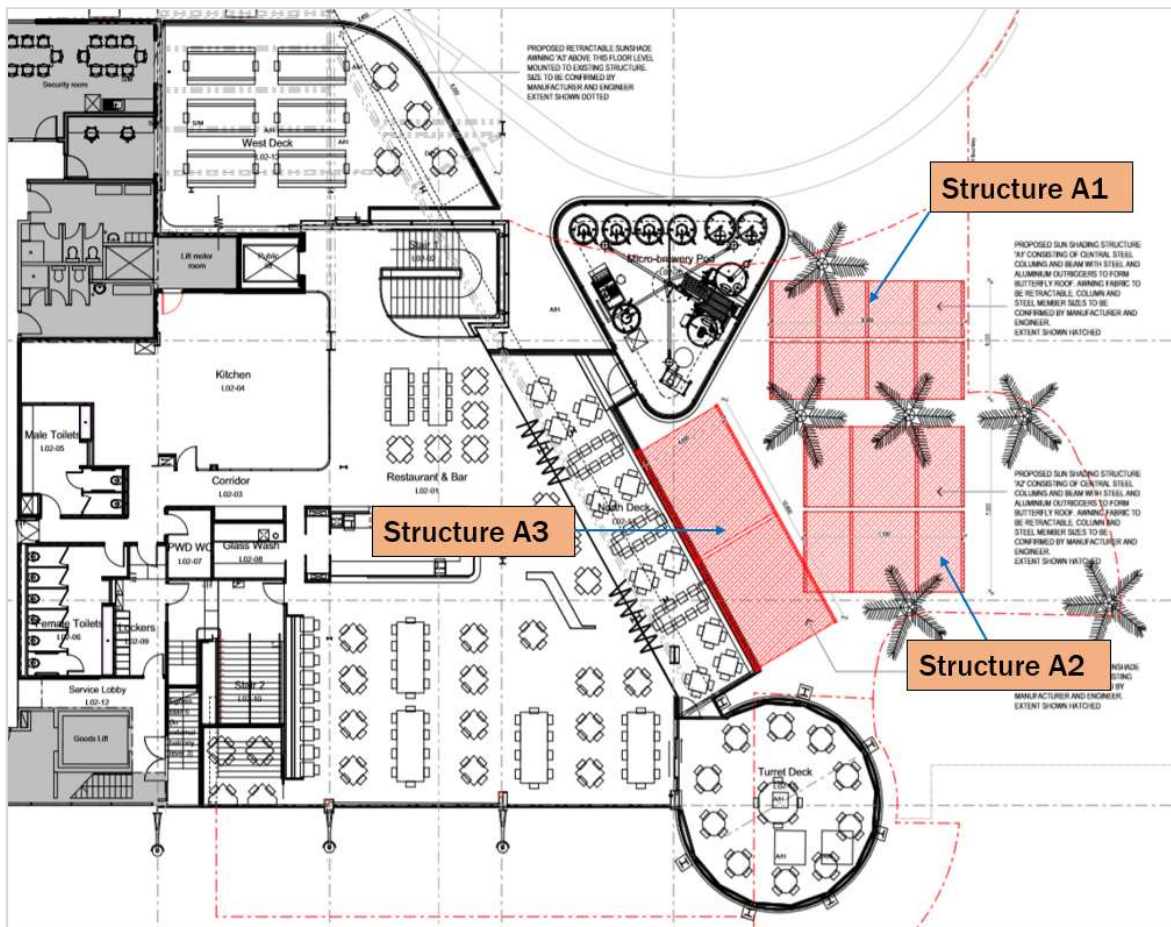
Location of Tenancy 5 OPT building shade structures – ground floor (Source: Greenlight Design)
